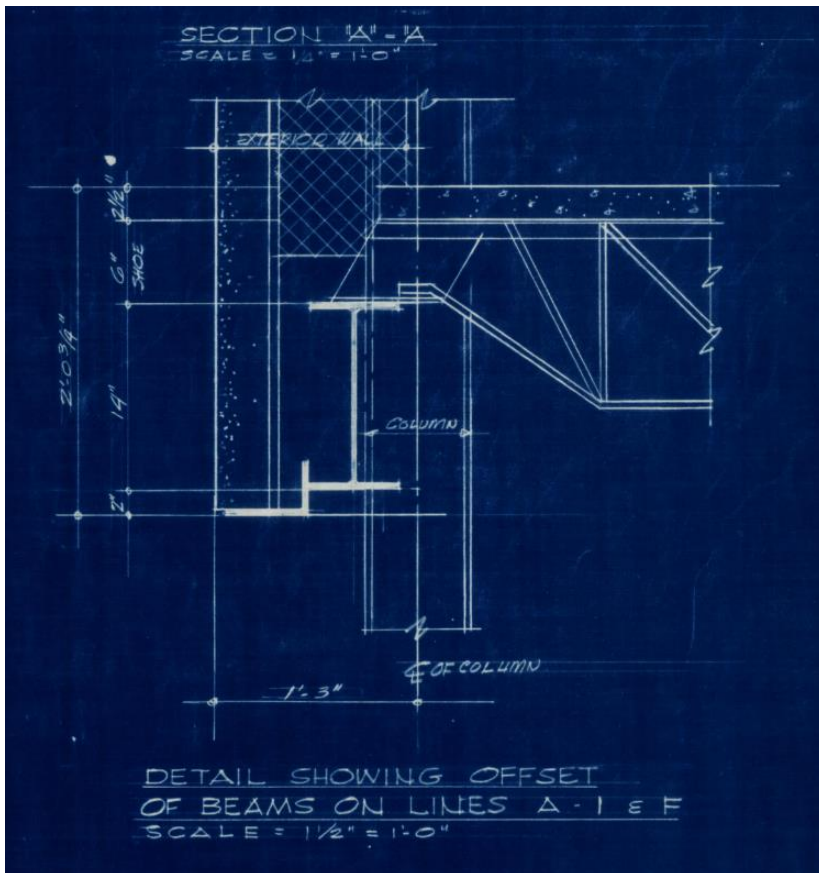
Typical Off-Set Beam Detail at GL 1 and F.
